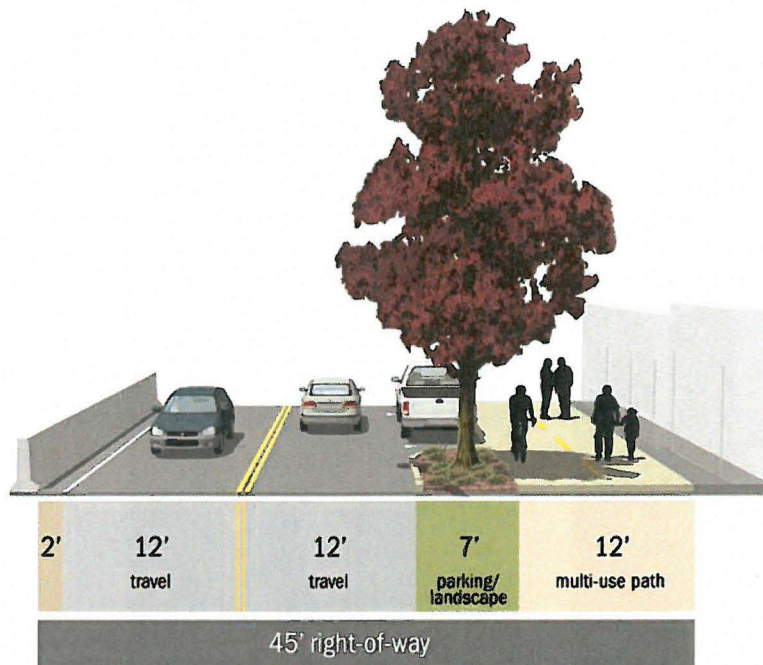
CONCEPTUAL CROSS-SECTION FOR MAIN ST - NORTH OF BETA ST
